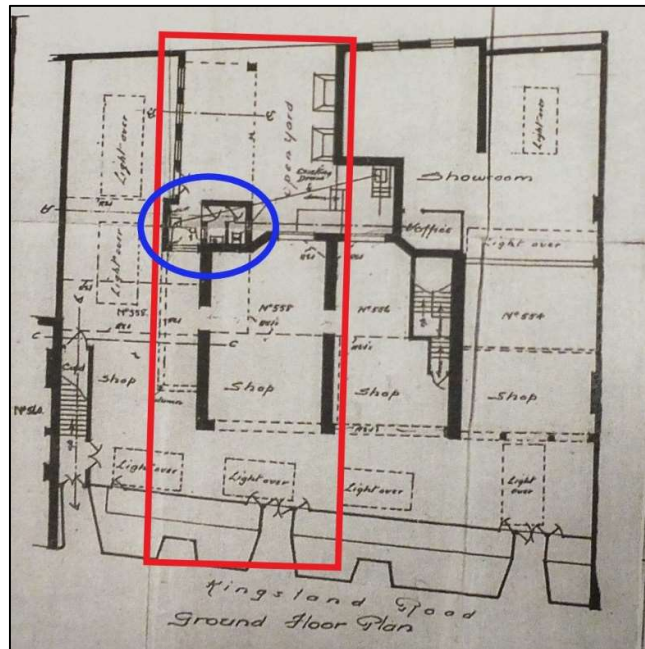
Drainage Plan, 1931 (Hackney Archives)
